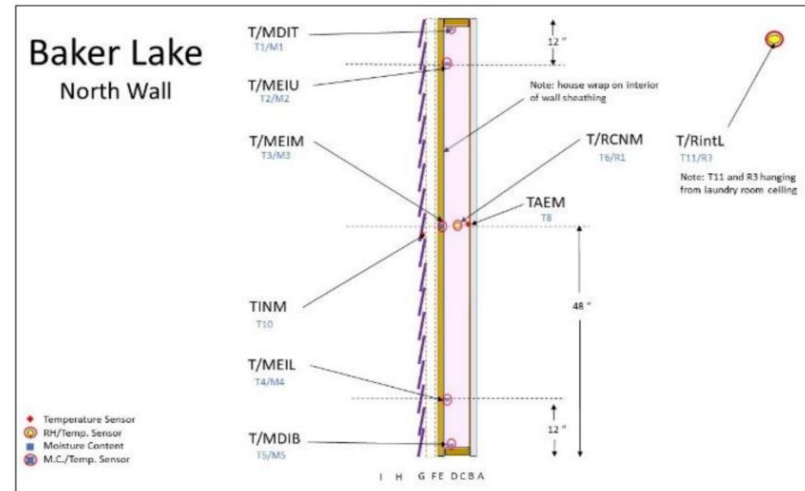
The wall system and monitoring sensor positions for the wall in Unit A
